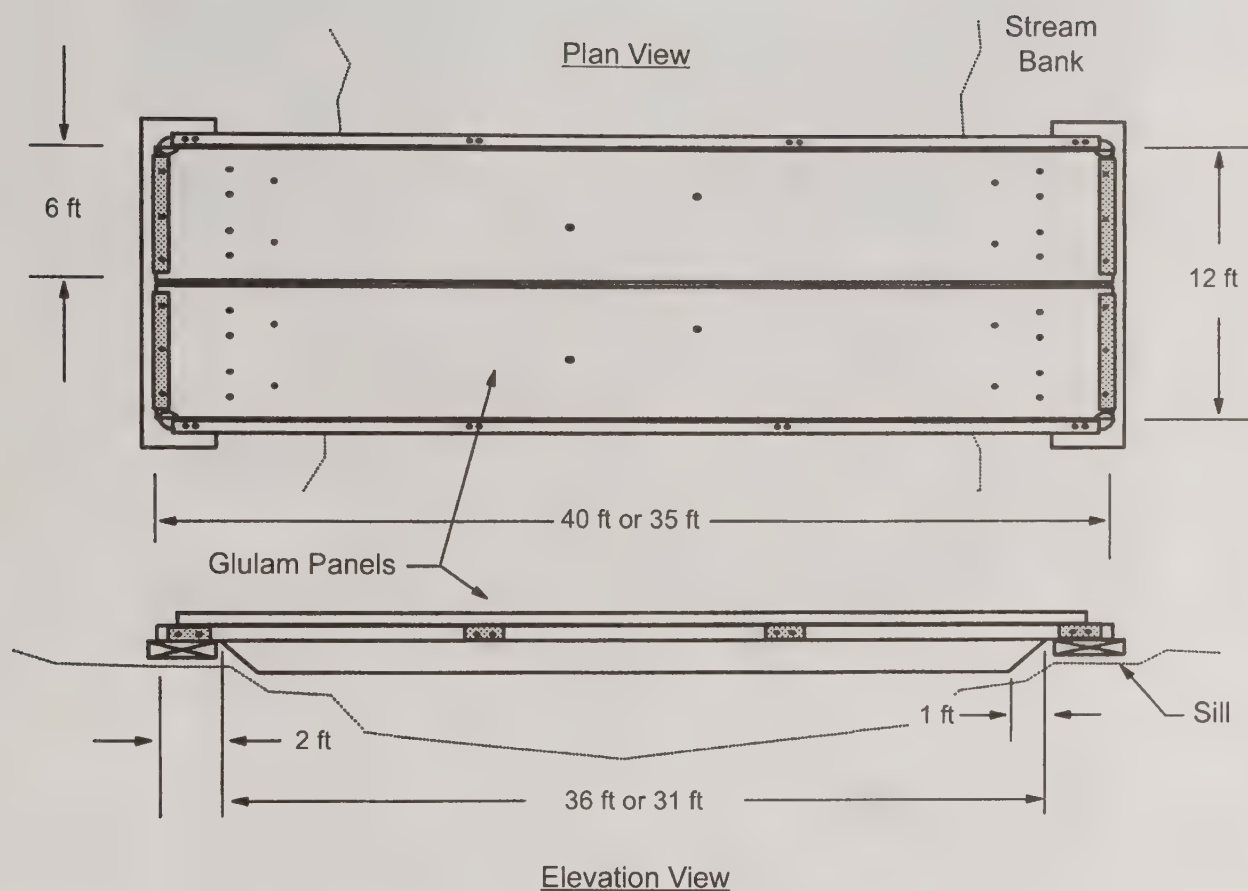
Plan and elevation view of Auburn's longitudinal glulam T-Section bridge for truck traffic. (Drawings provided by Steven Taylor)
